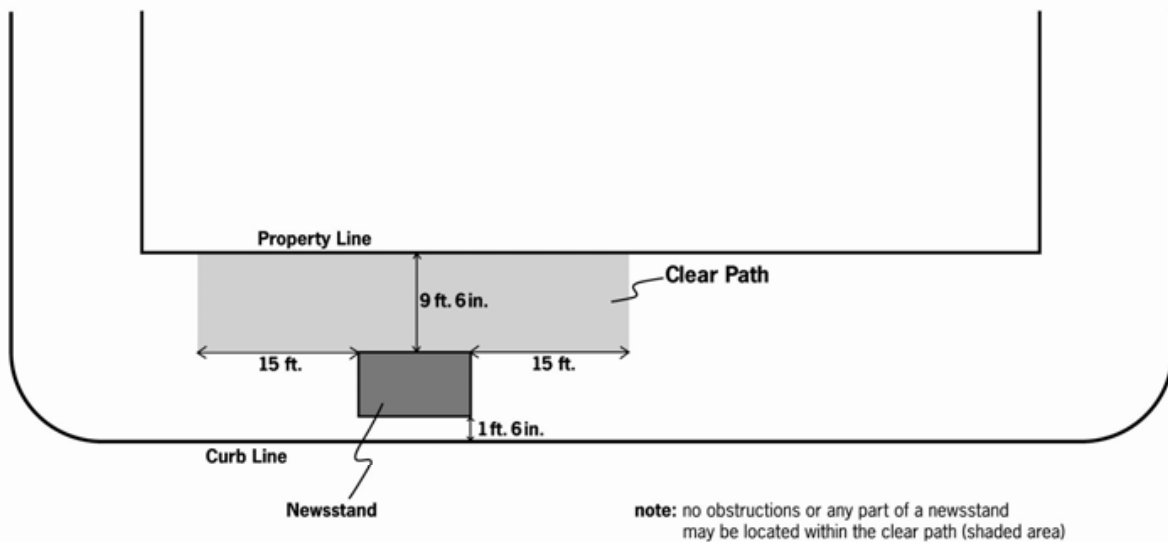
Typical blockfront plan showing clear path for curb-line stand
